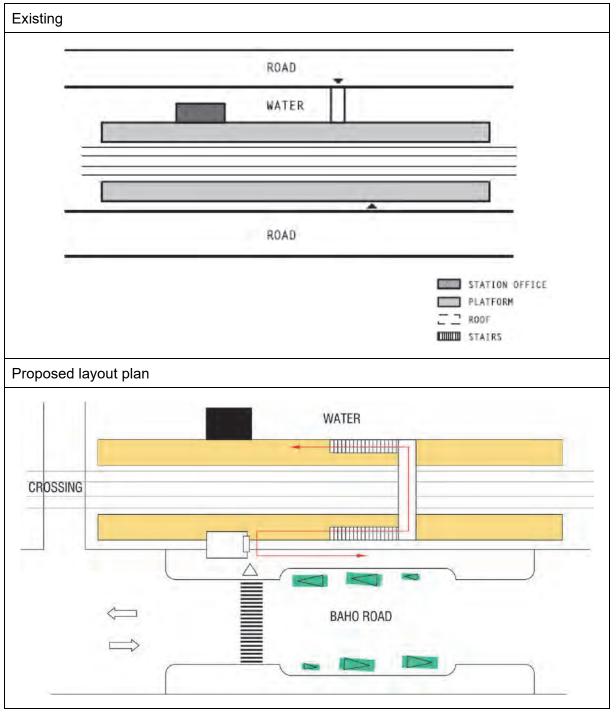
Existing and Proposed Layout Plan (Kamayut Station)
